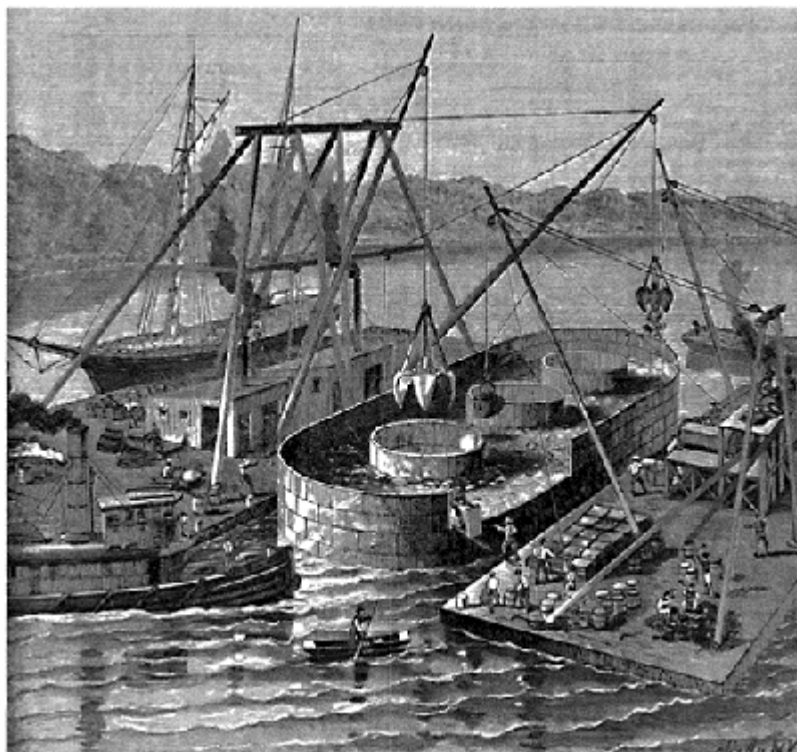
Sinking of caisson of Hawkesbury Bridge with store ship on left and concrete and supplies barge on right (Scientific American, 1886).
